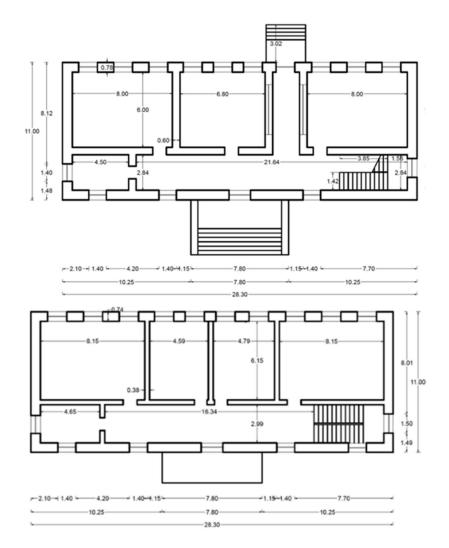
The ground (up) and floor plan (down) of the historic school building (Galakia).
